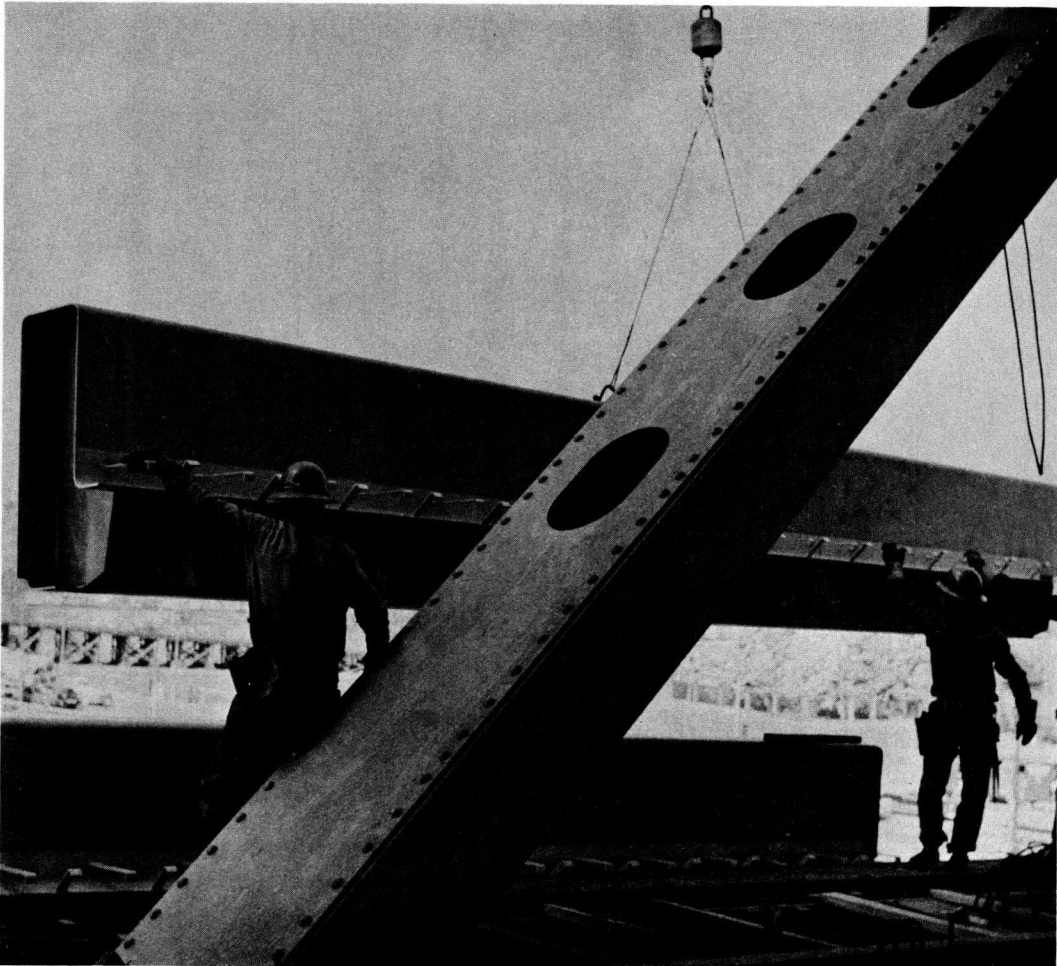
Lightweight welded plate parapet for Fort Pitt Bridge, Pittsburgh, Pa.
